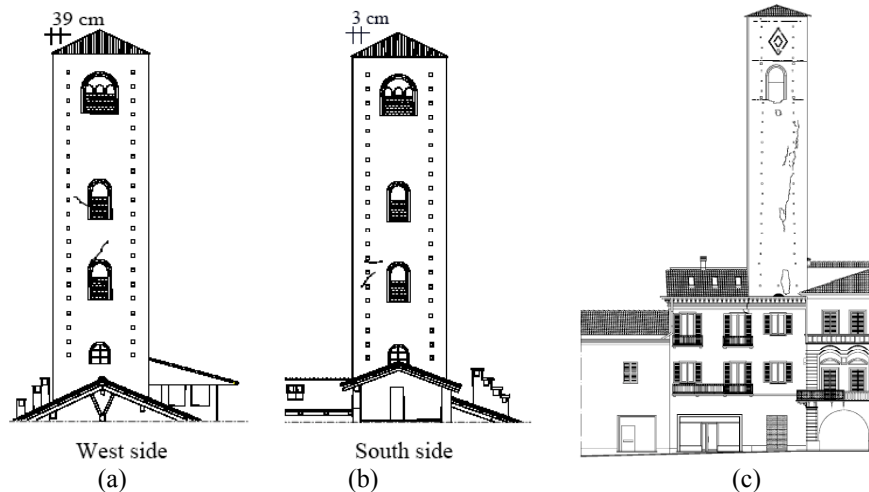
Elevations and crack patterns of the towers: Torre Sineo (a) (b), Torre Astesiano (c).
